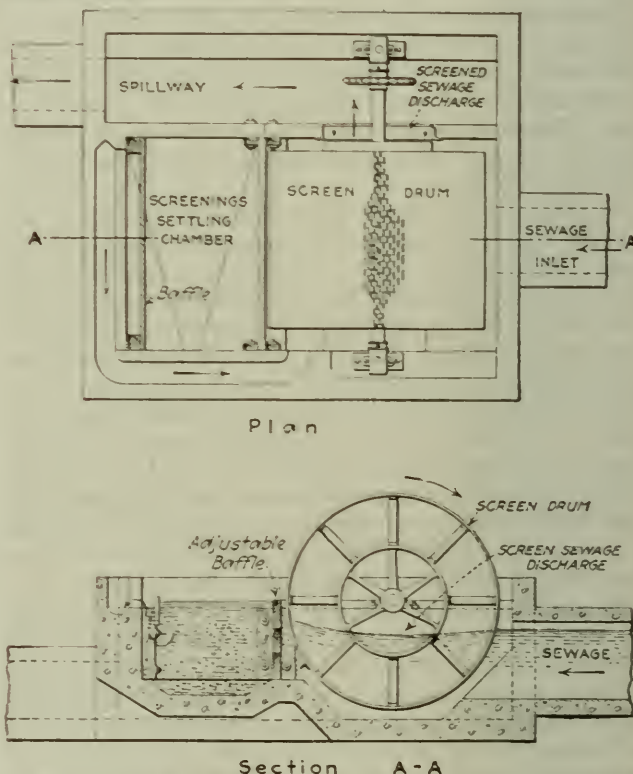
PLAN AND ELEVATION OF DORRSCO SCREEN
